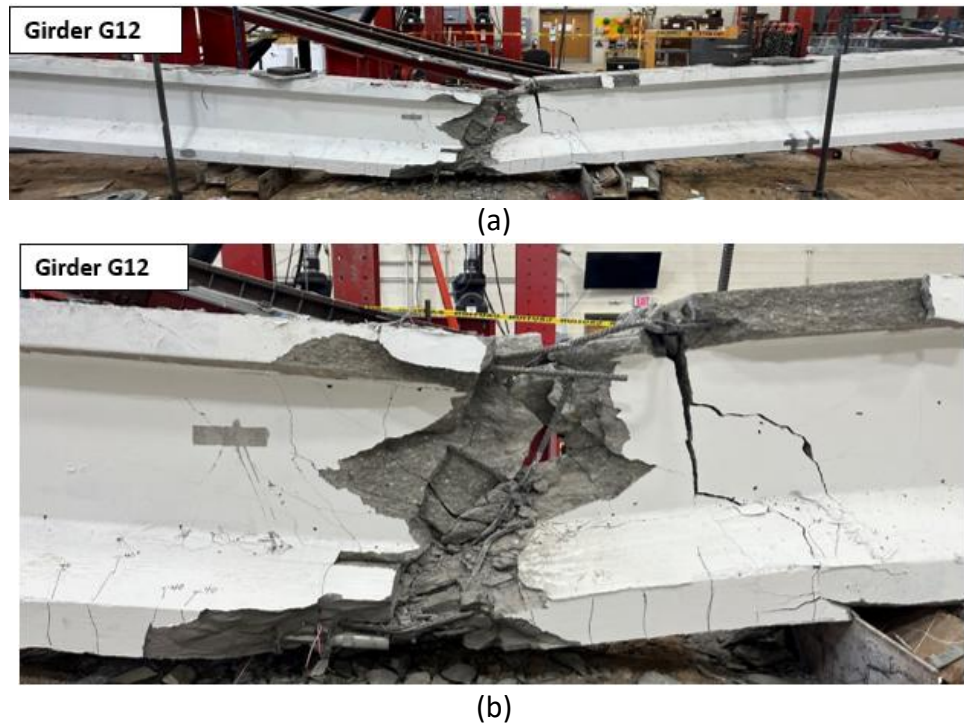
Photographs of G12 showing (a) Failure of 33% damage repaired girder at midspan (b) Close-up view of girder failure
